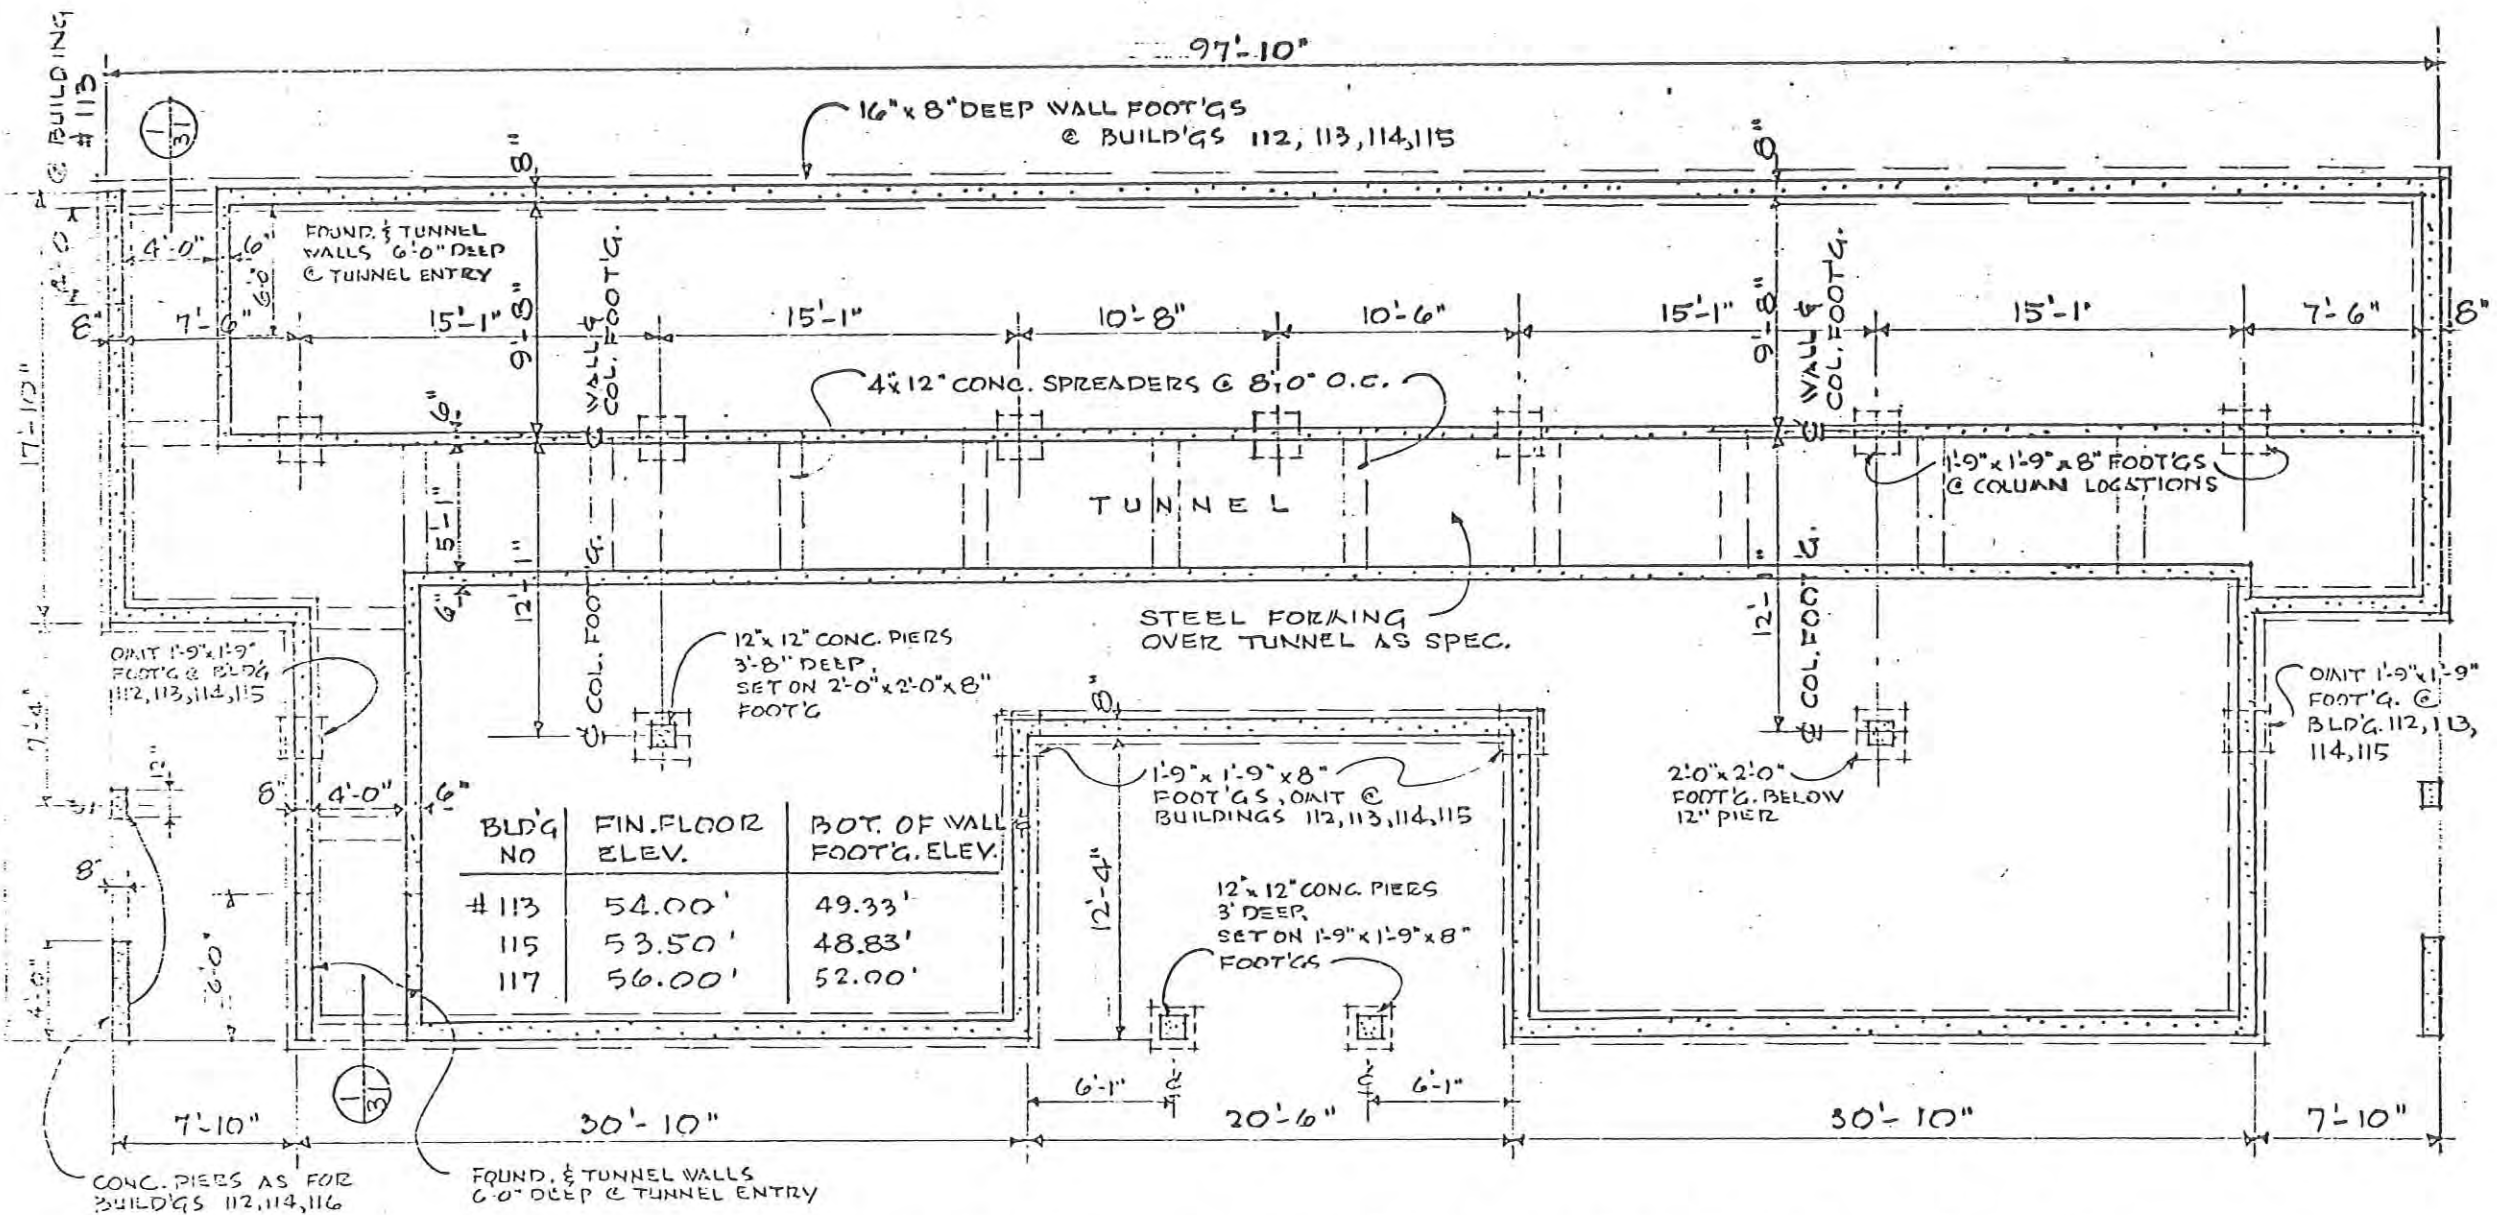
ORIGINAL FOUNDATION PLAN
